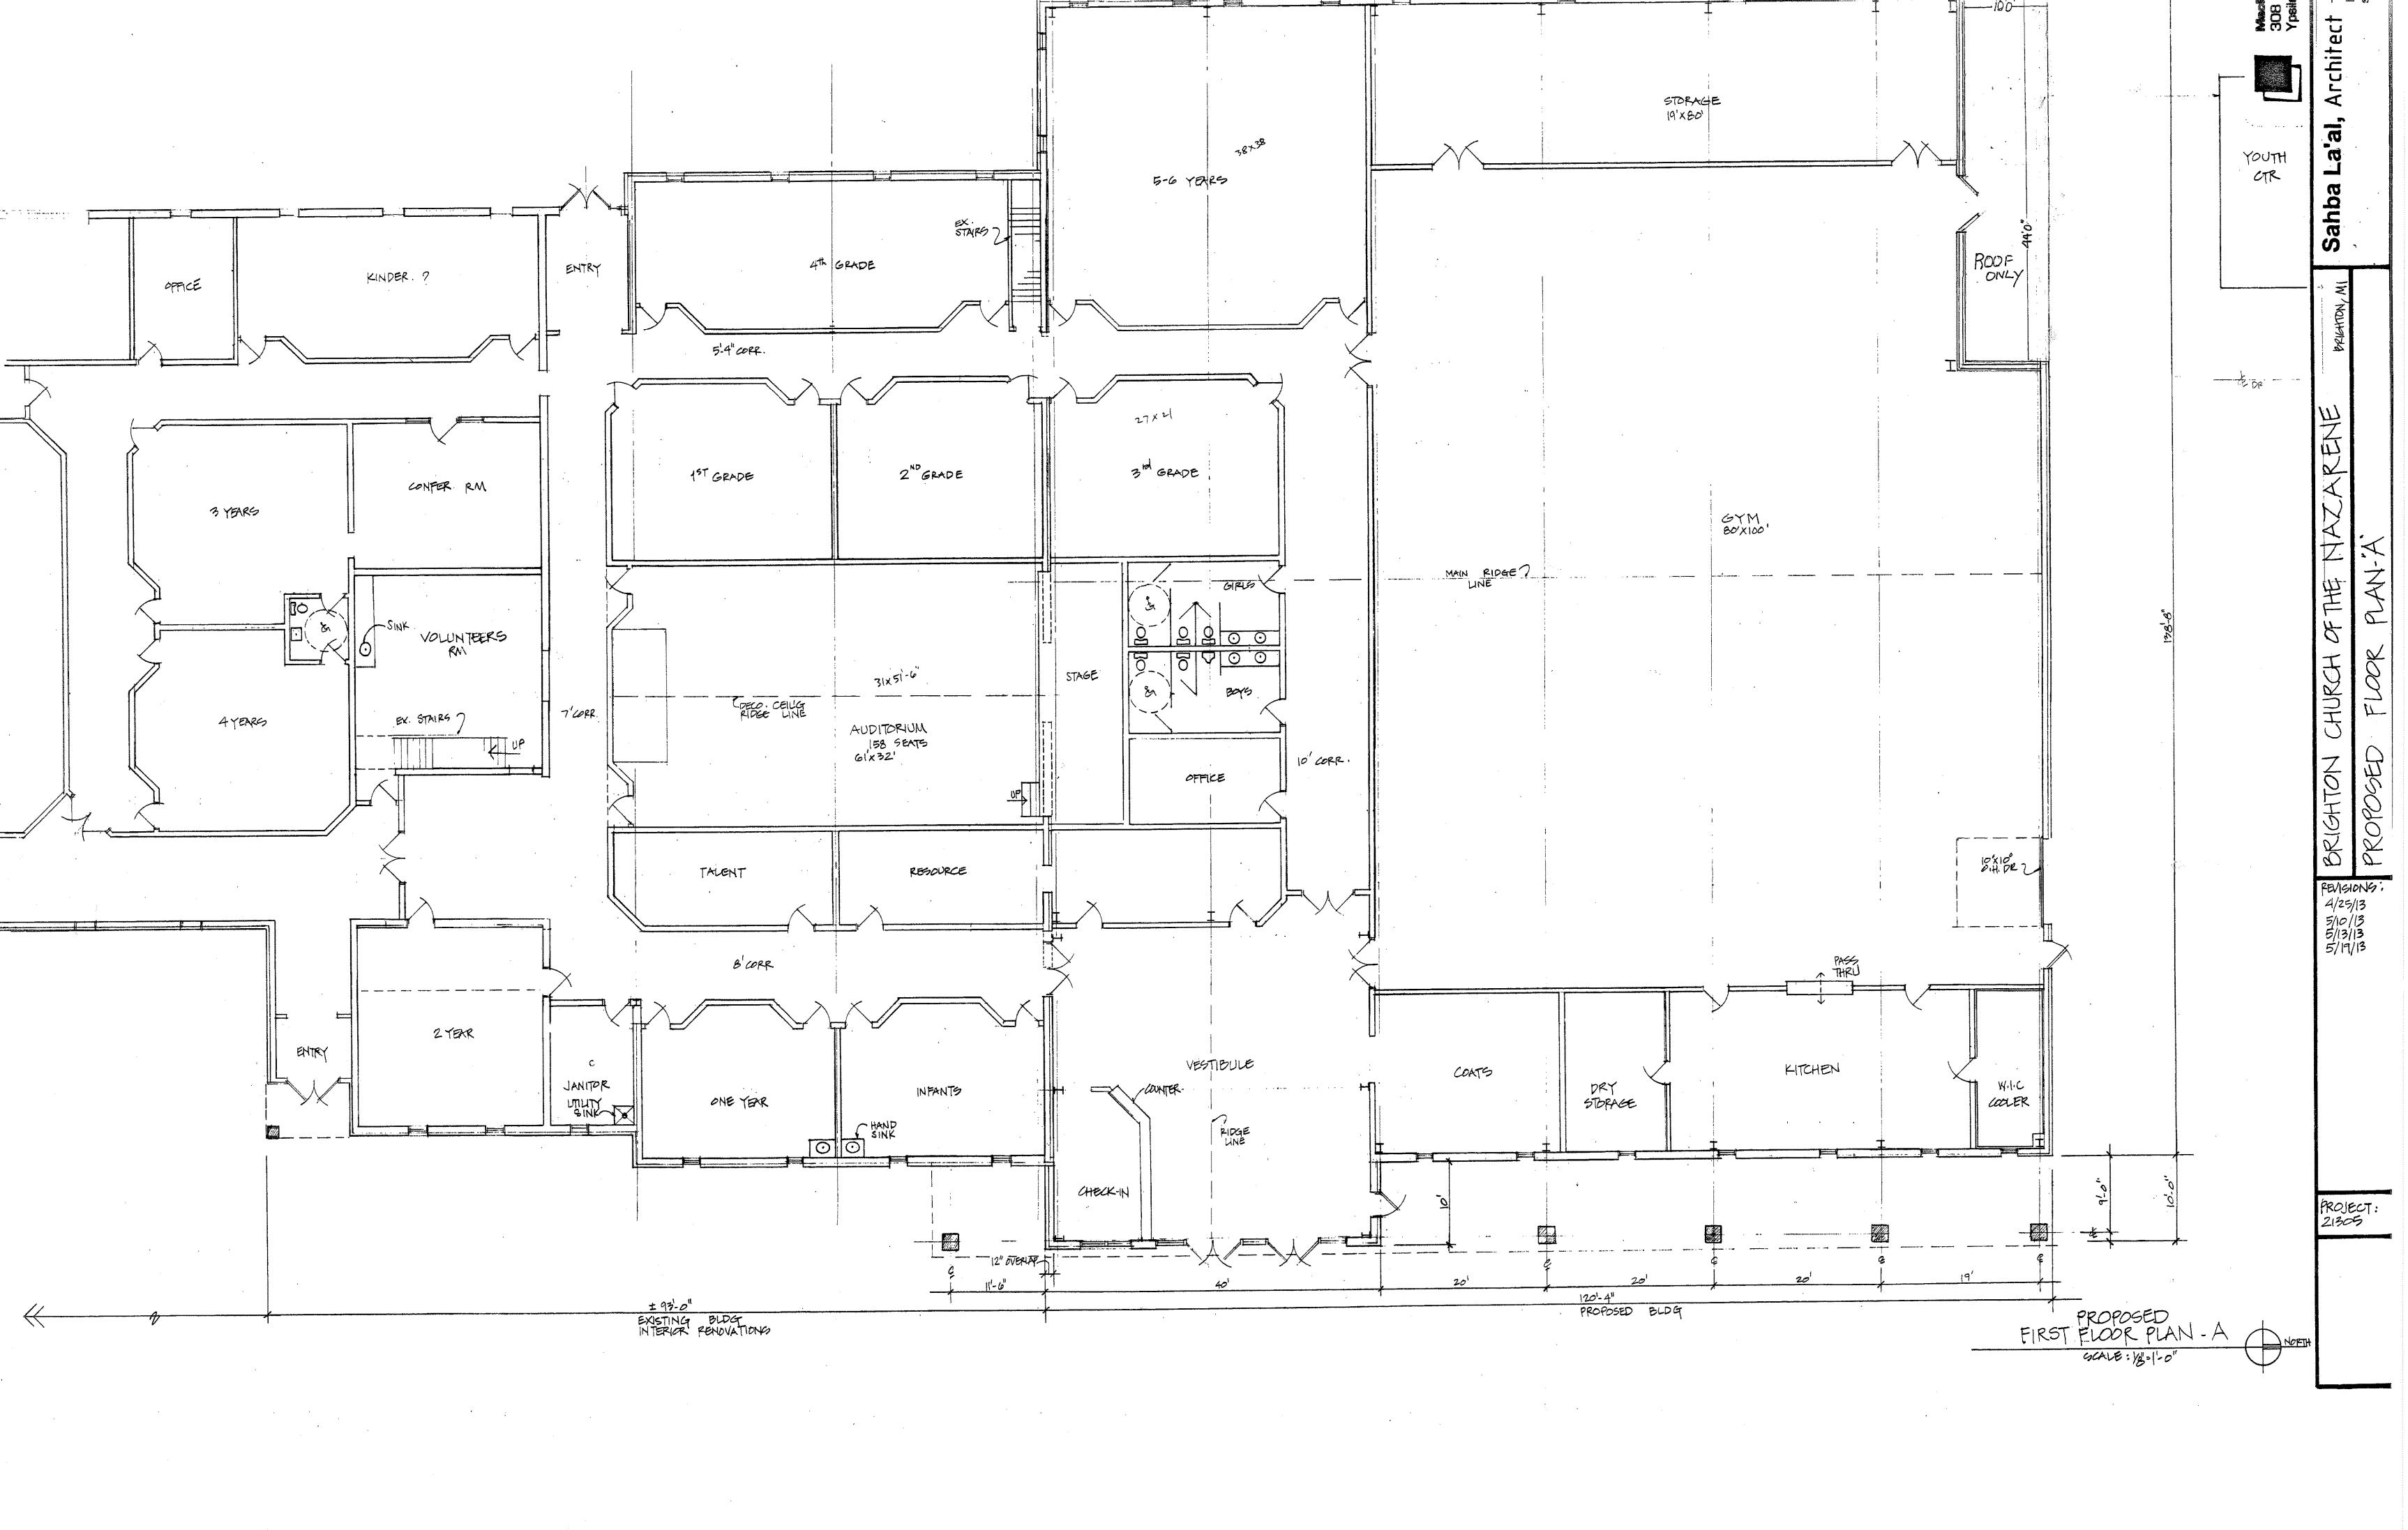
DETAILS CHURCH CONSTRUCTION B.N.C. FAC
